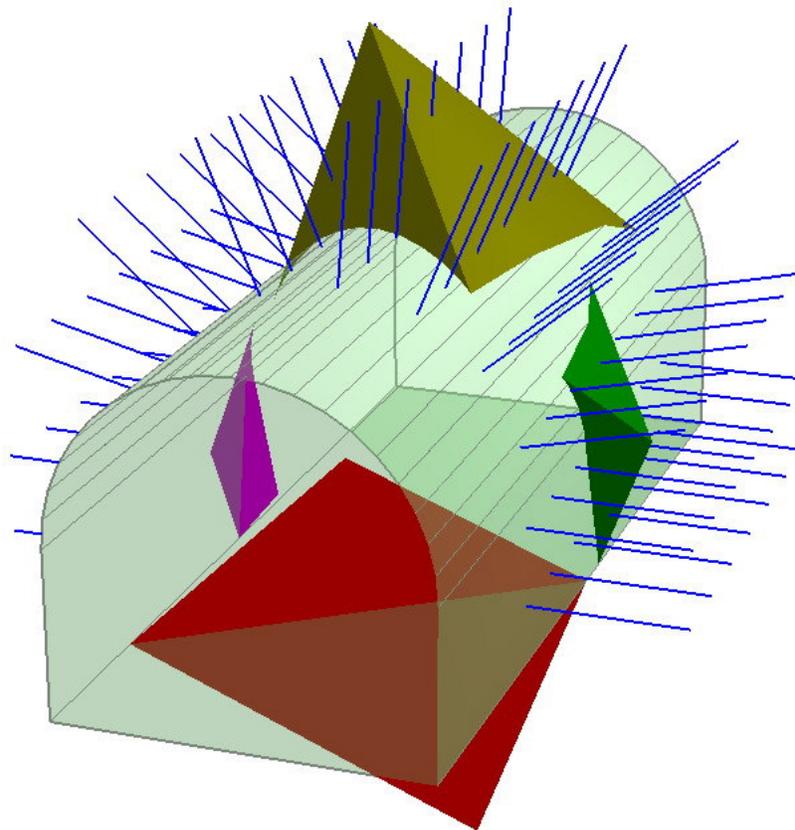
Rock bolting pattern to stabilize the roof and sidewall wedges in the tunnel example discussed earlier.
